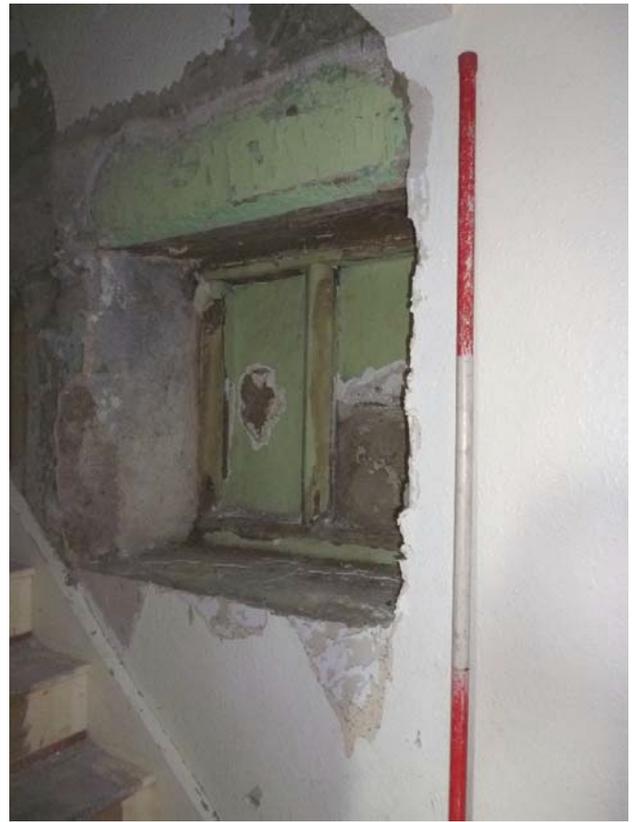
(left): Cupboard door, west side of the south elevation, Room G2
